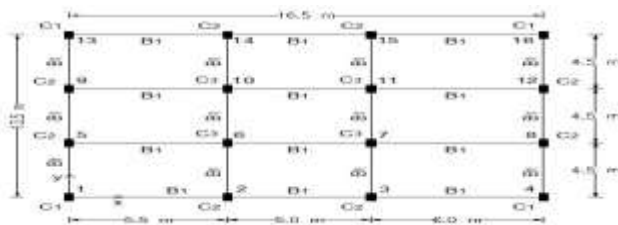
Typical Floor plan for (G+6) Storied building Fig 2. Model of G+6 building by using STAAD- PRO
